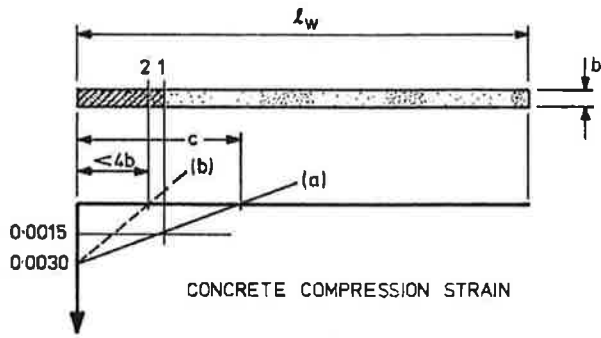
STRAIN PROFILES AFFECTING THE LATERAL STABILITY OF THIN WALL SECTIONS
